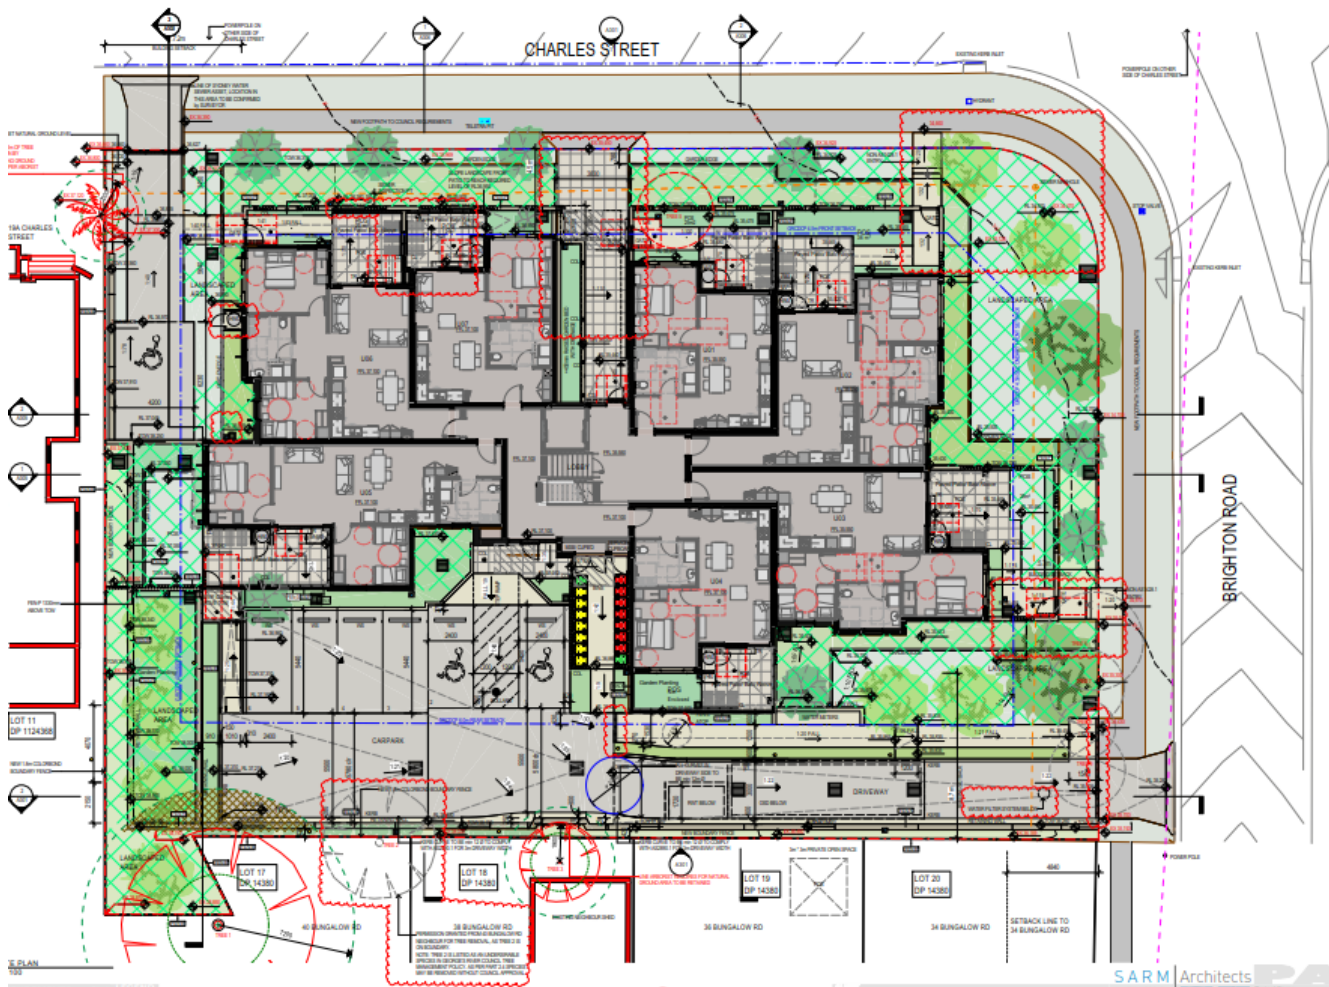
Extract from Architectural Plans – Site Plan (Source: Architectural Plans, SARM Architects, dated 20/10/2023)
